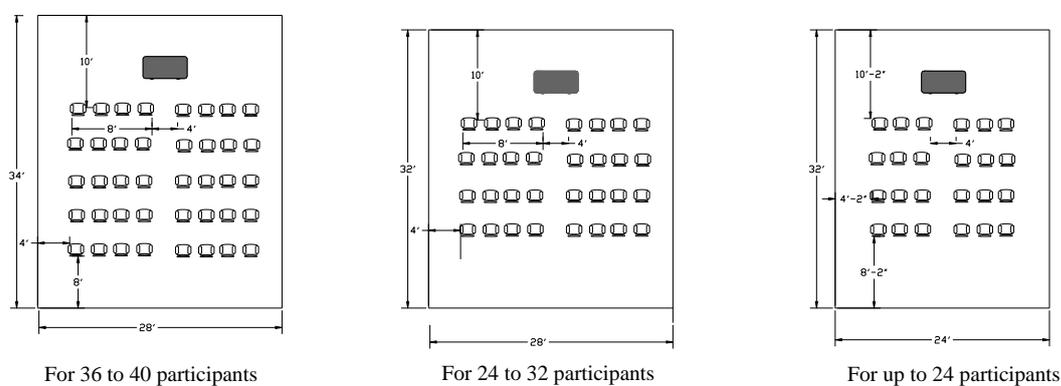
CLASS ROOM SITTING ARRANGEMENT WITHOUT TABLES
